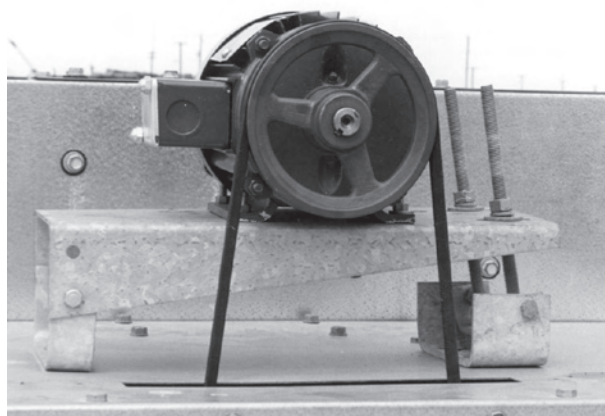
Adjustable motor mount for V-belt driven fan (belt guard removed).
